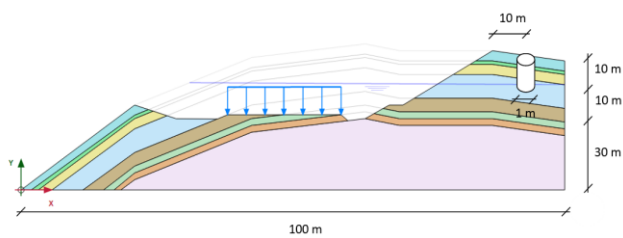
Cross Section Placement of Control Wells 100 m Slope Overview Area
